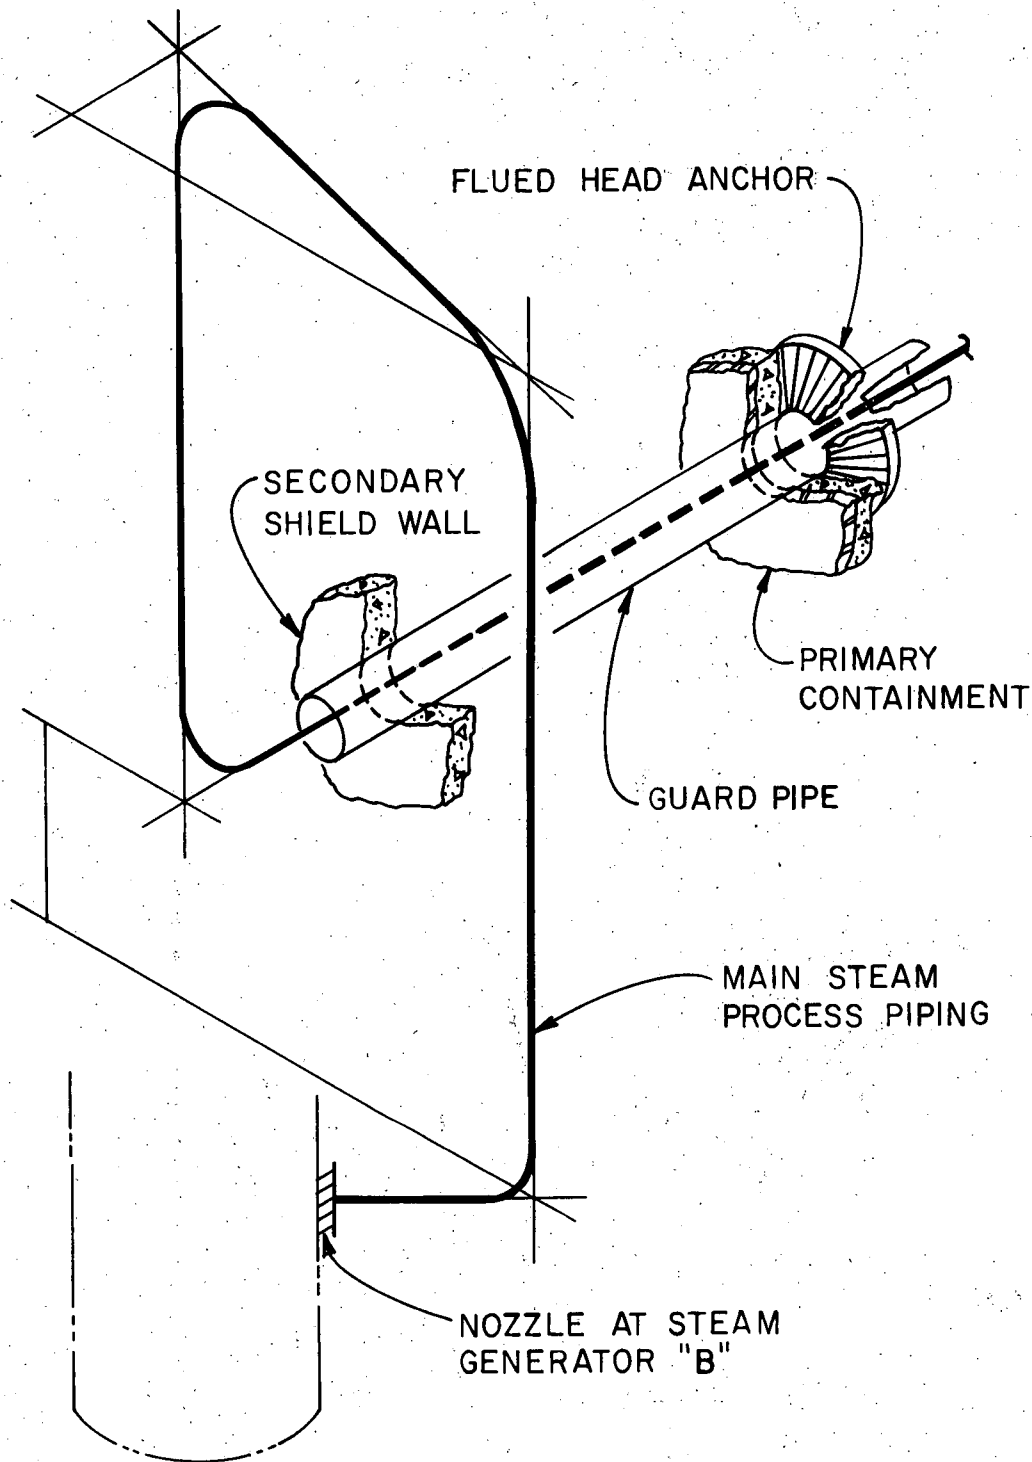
·0-2 TYPICAL ISOMETRIC OF MAIN STEAM PIPING
